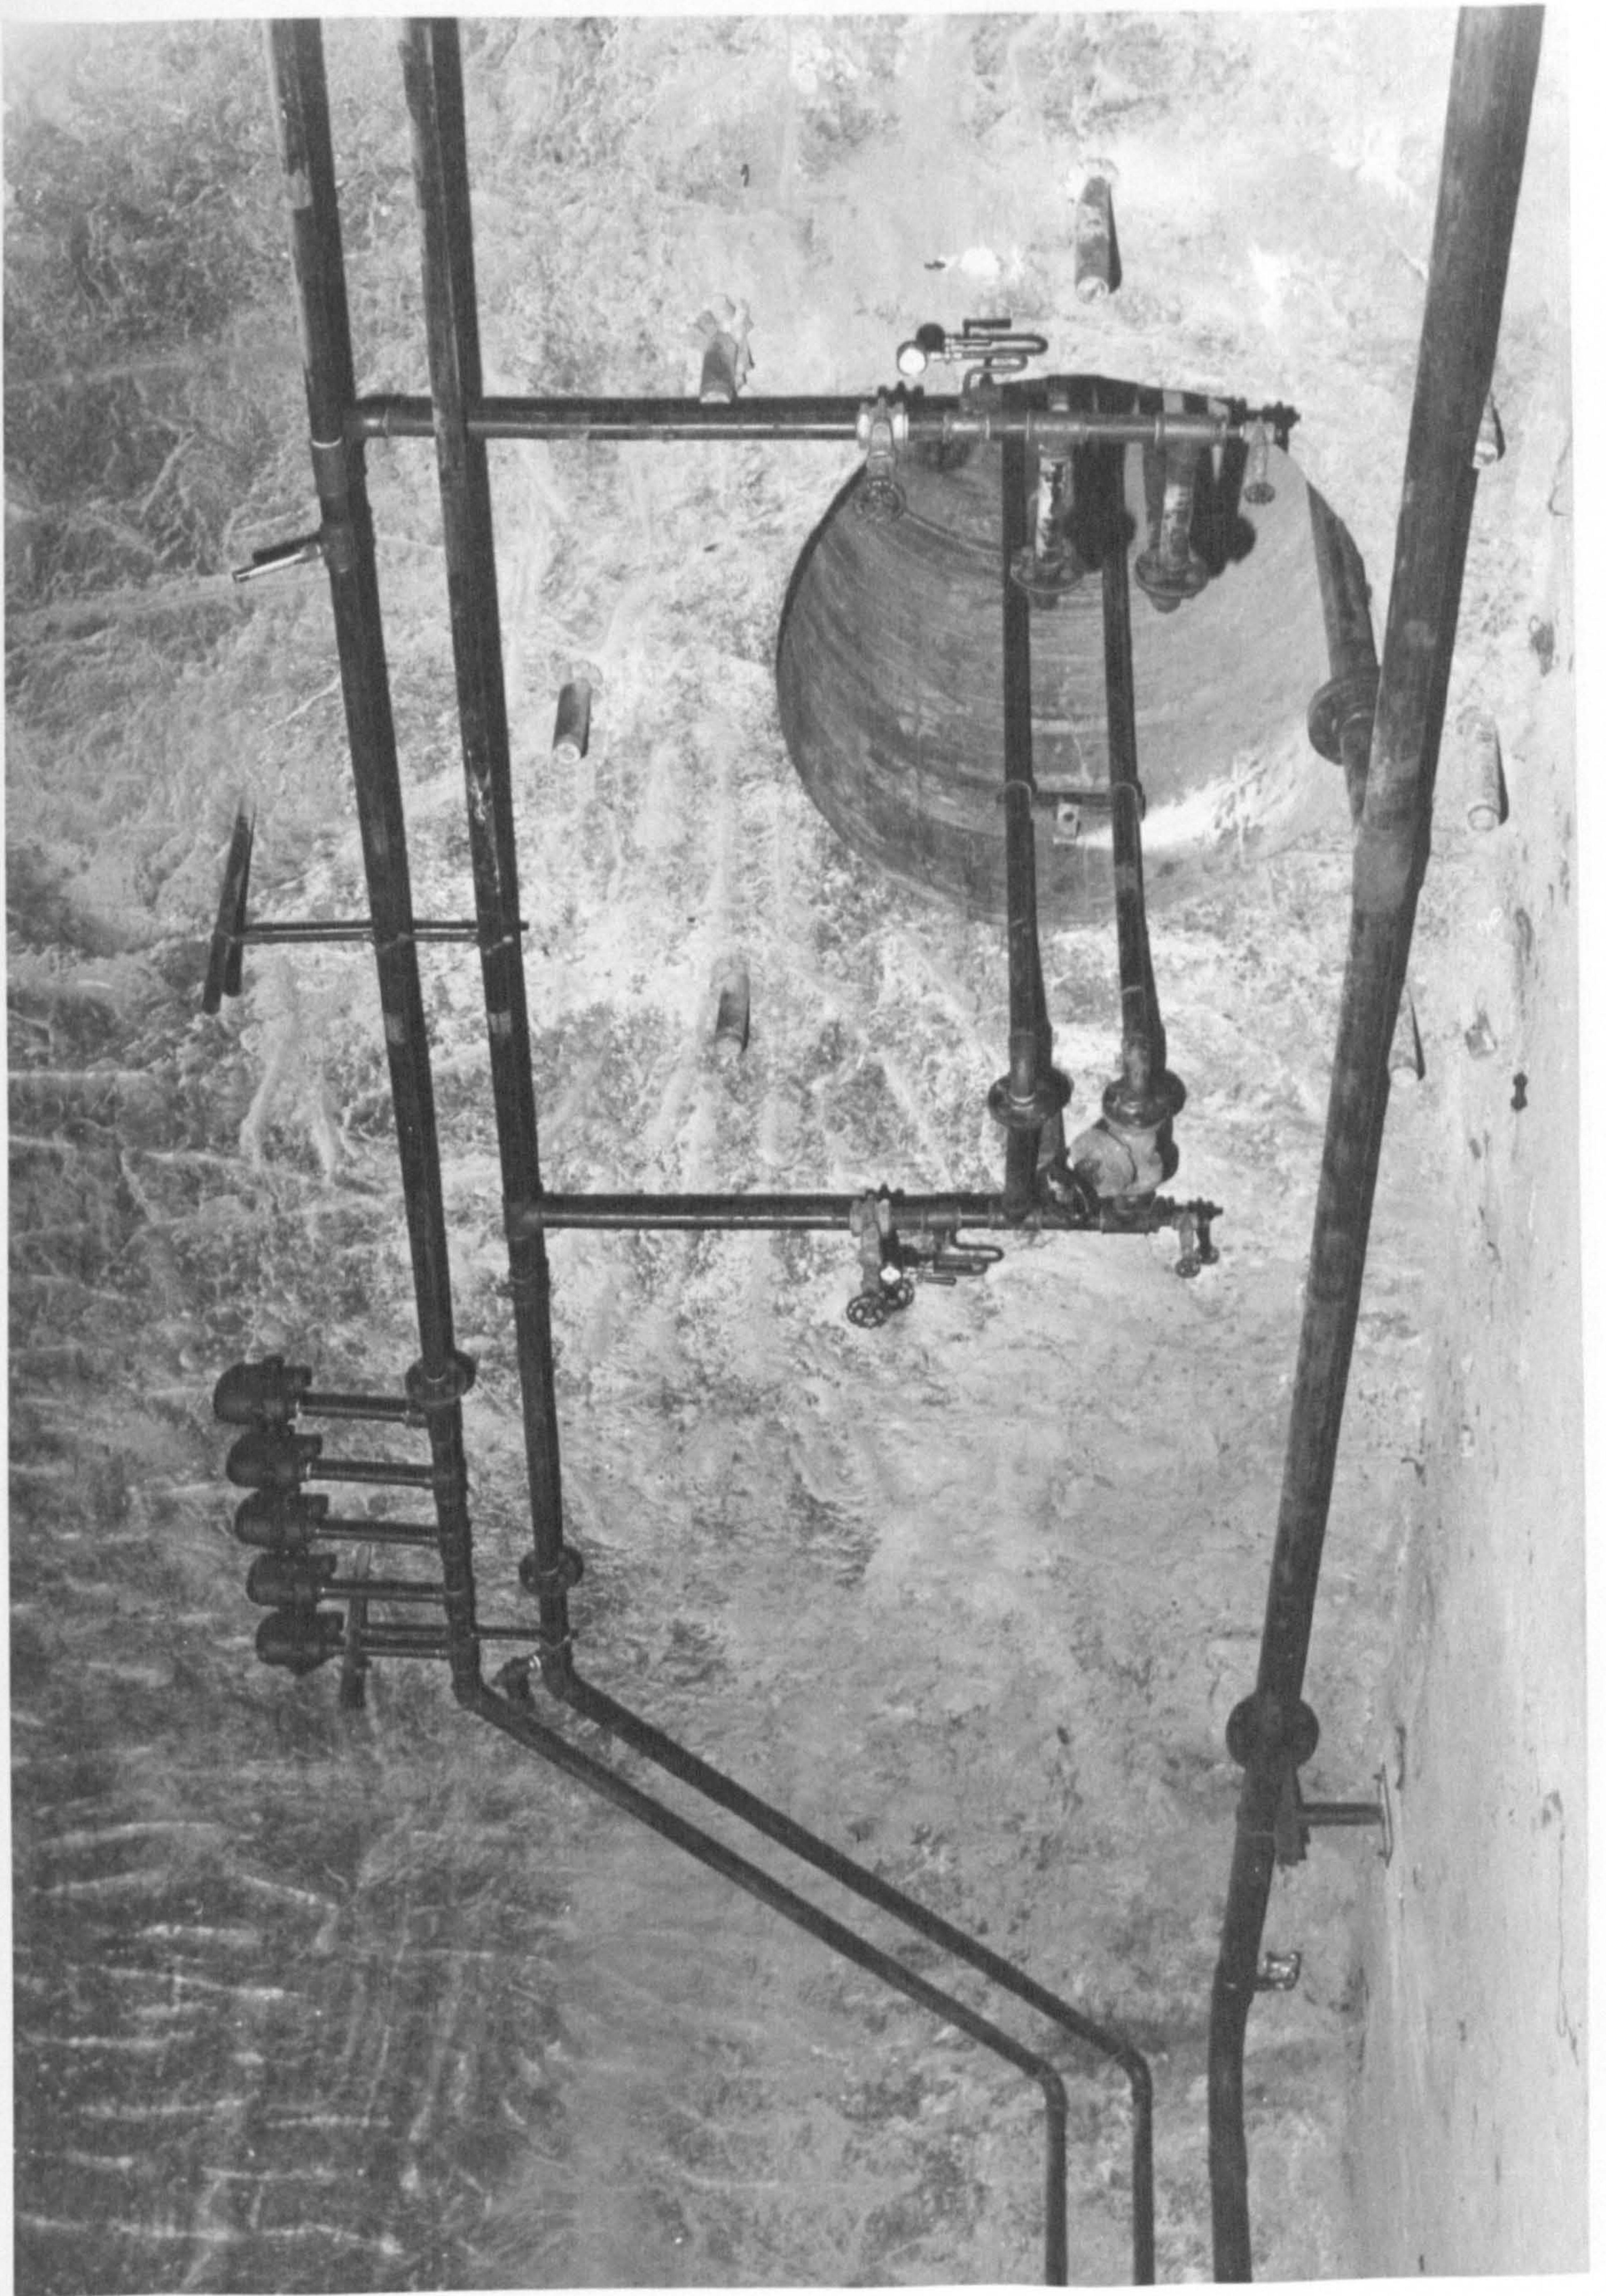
GENERAL VIEW OF THE ACCESS ROOM SHOWING HEATER/CHILLER AND COMPRESSED AIR PIPEWORK
